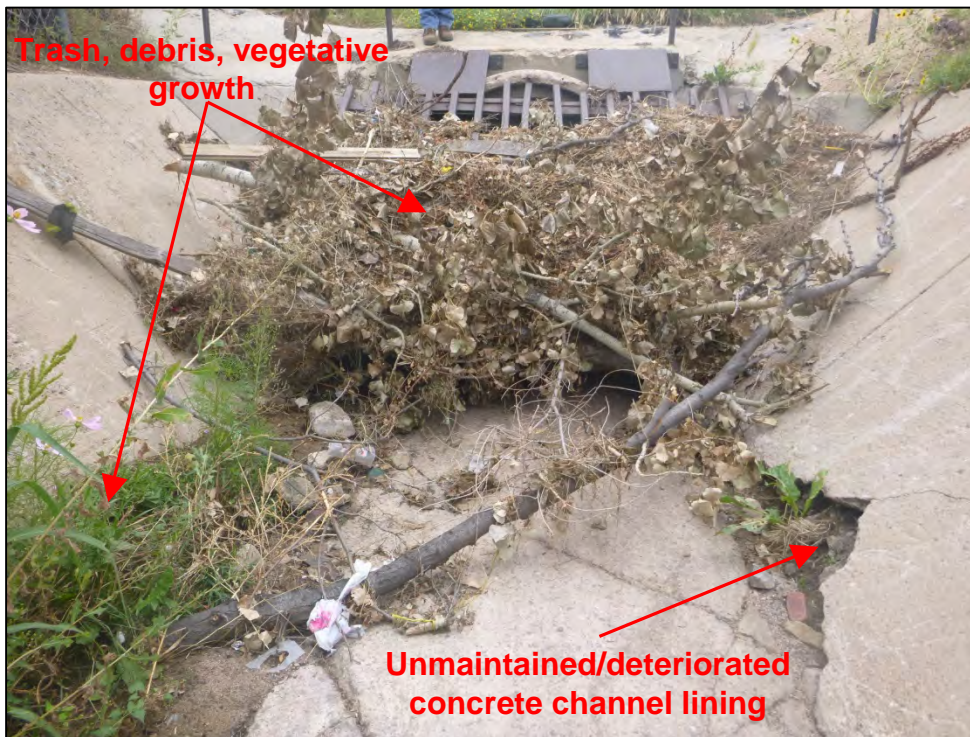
View, facing upstream, in channel of trash, debris, accumulated sediment and vegetative growth at the culvert pipe inlet trash rack and within the concrete lined channel itself.
